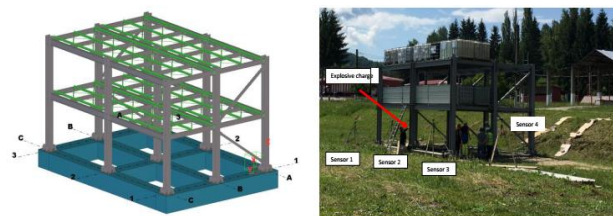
Geometry of the blast test provided [27] showing locations of explosive charge and sensors
